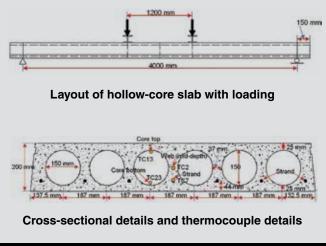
Layout and cross-sectional details of a tested prestressed concrete hollow-core slab. Note: TC = thermocouple. 1 mm = 0.0394 in.
